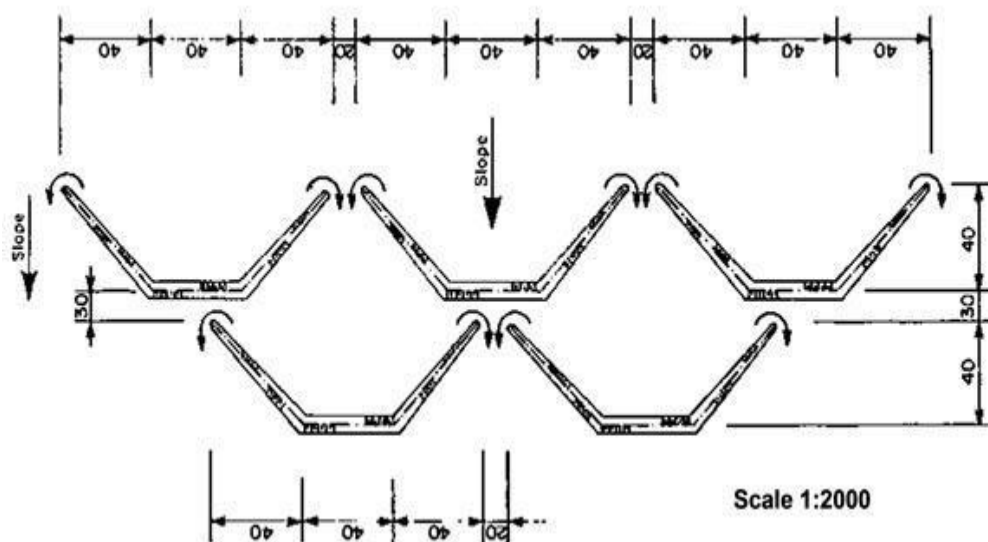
Layout of Trapezoidal Bund. (Source: Barron and Salas, 2009)
